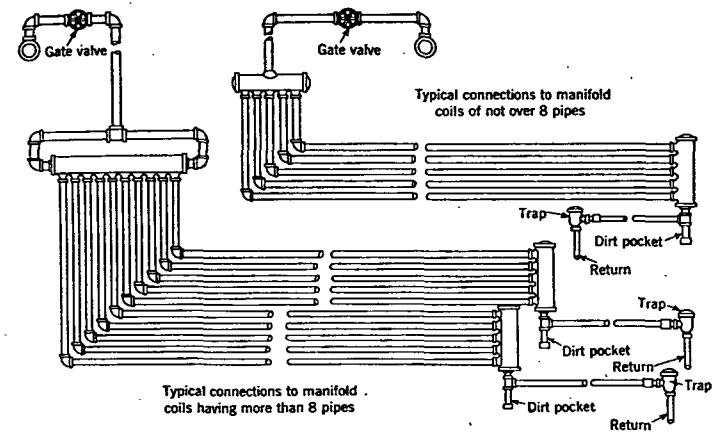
TYPICAL PIPE COIL CONNECTIONS
